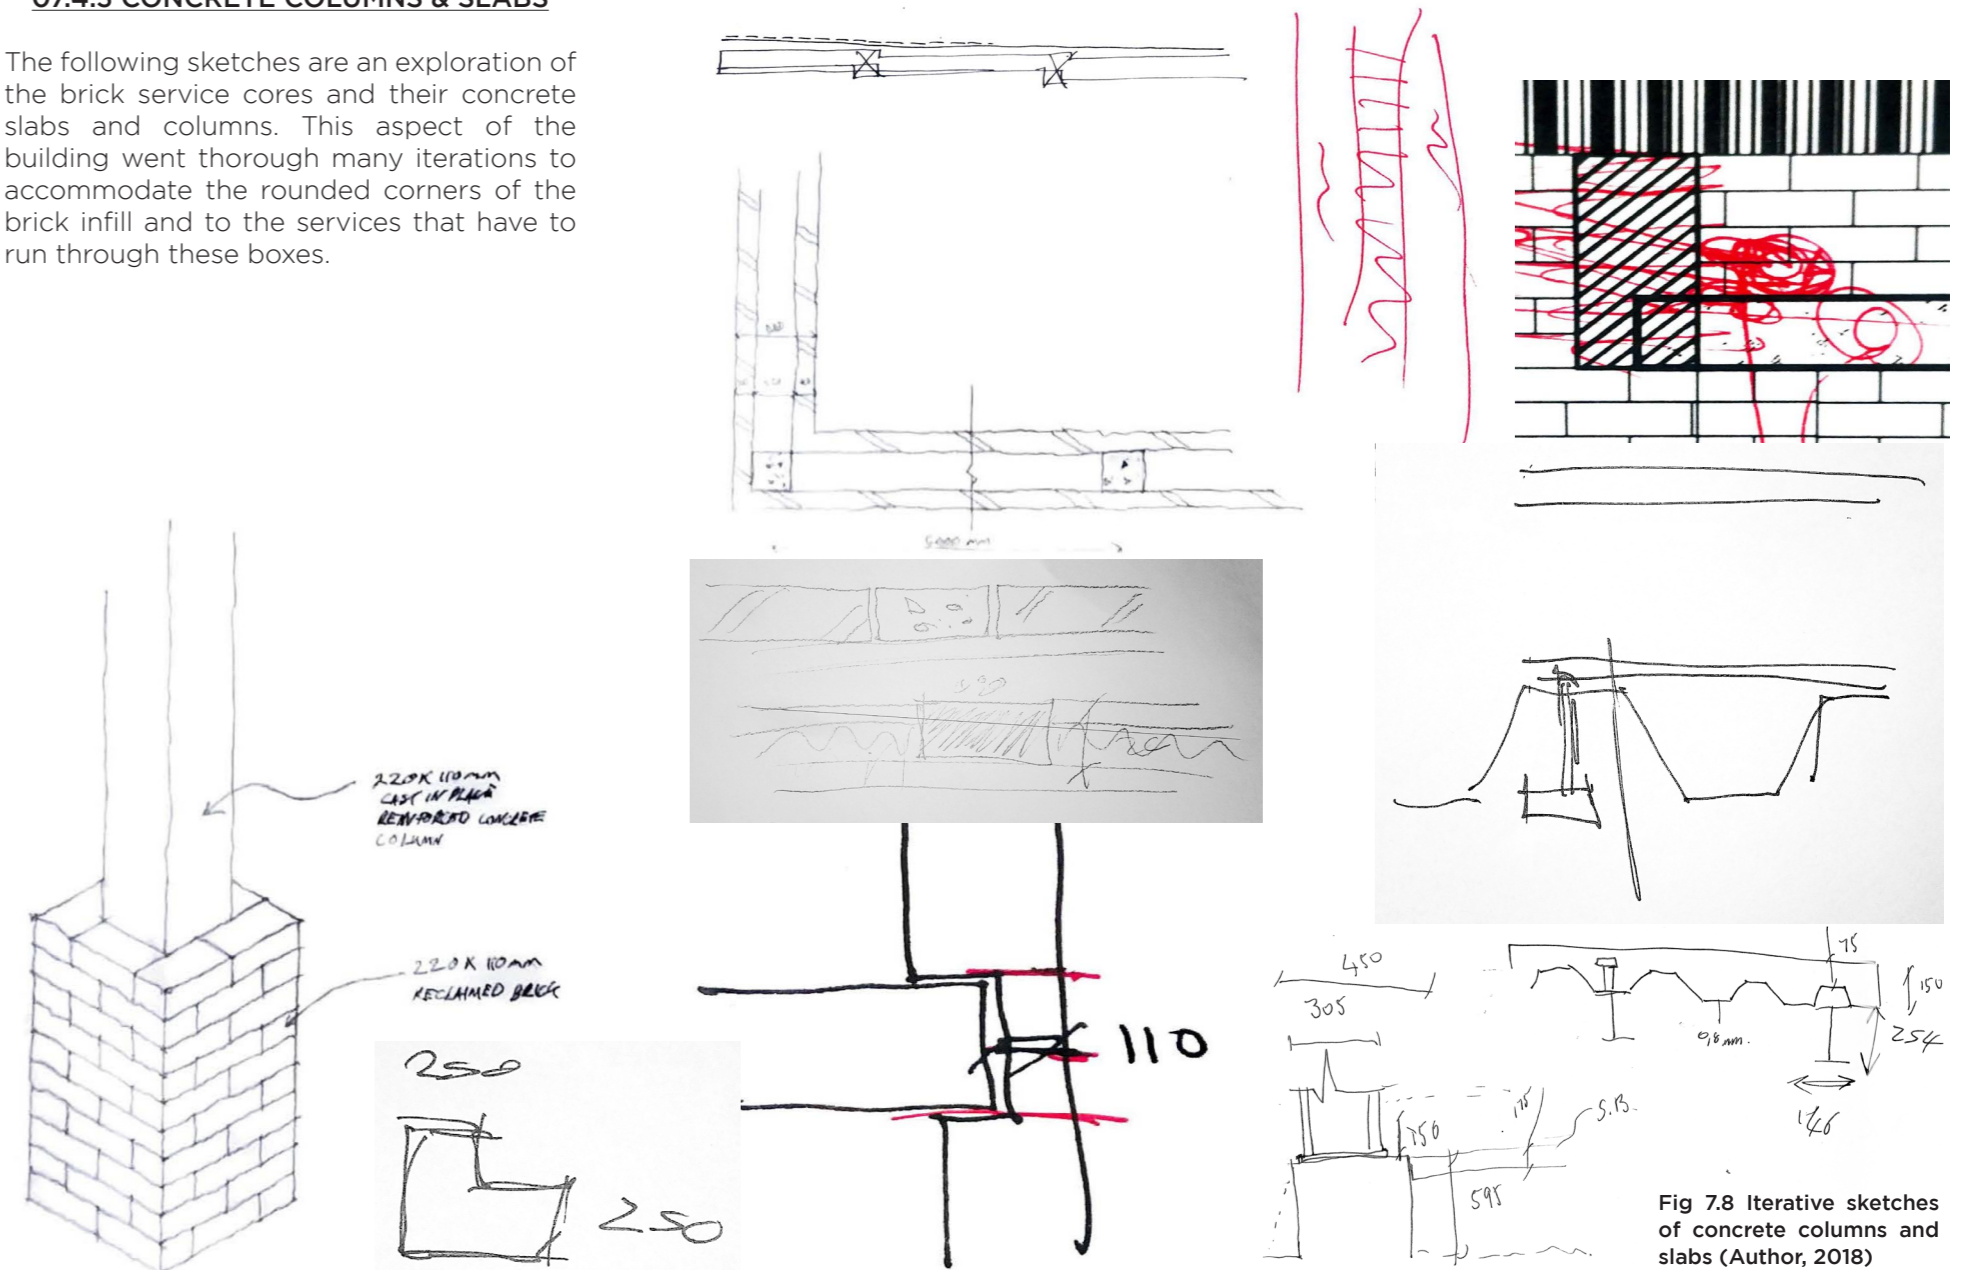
Iterative sketches of concrete columns and slabs (Author, 2018)
